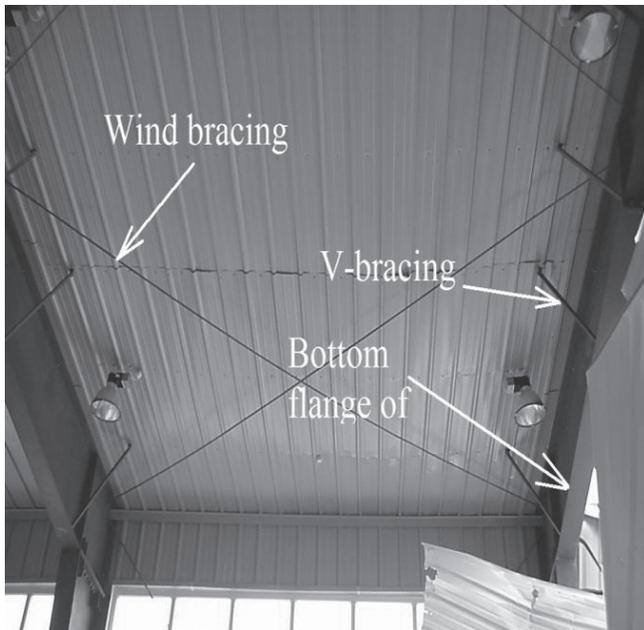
Roof wind bracing and the V-bracing of the bottom flanges of rafters.
